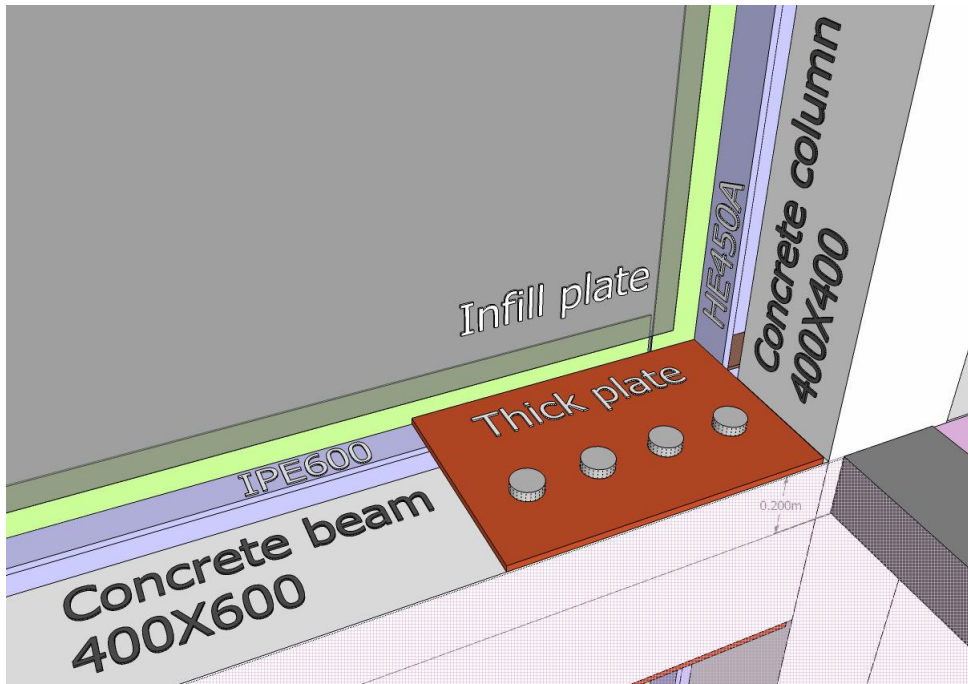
Proposed connection principle between the external frame and the concrete frame.
